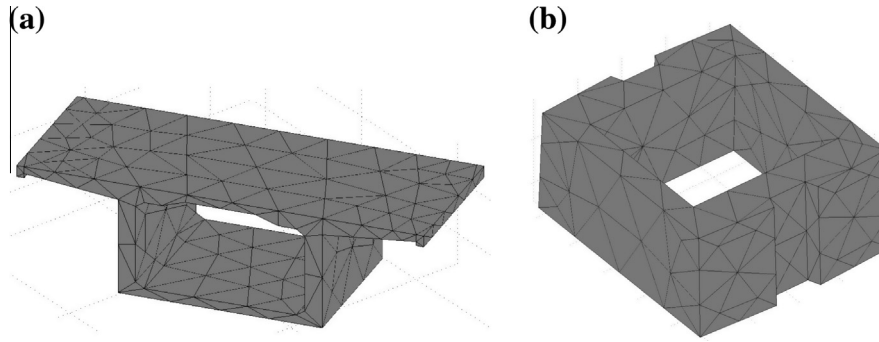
(a) A typical 5 m section of the deck with its FE mesh, (b) a typical 4 m section of the tallest pier with its FE mesh.
